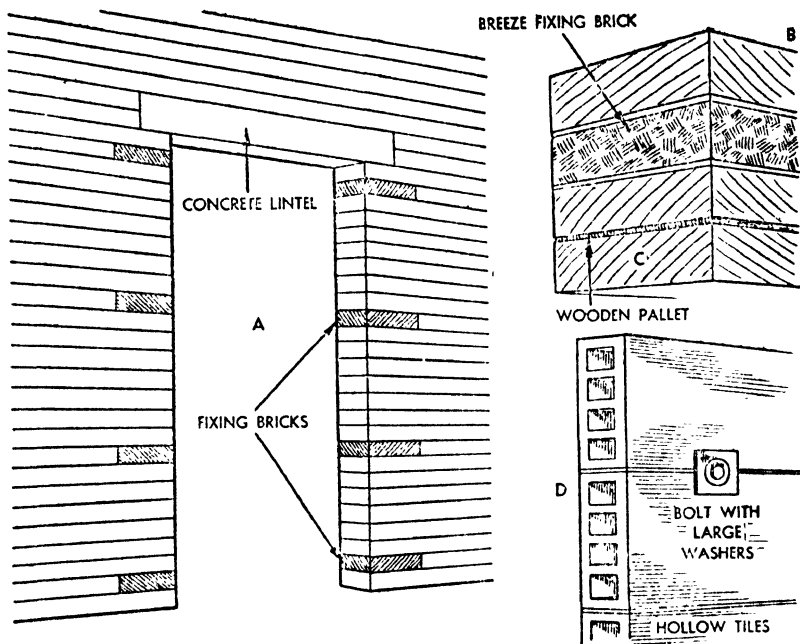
A. Arrangement of fixing blocks around a doorway opening; B. breeze fixing block; C. wooden pallet in joint; D. bolts through "pot" wall.
